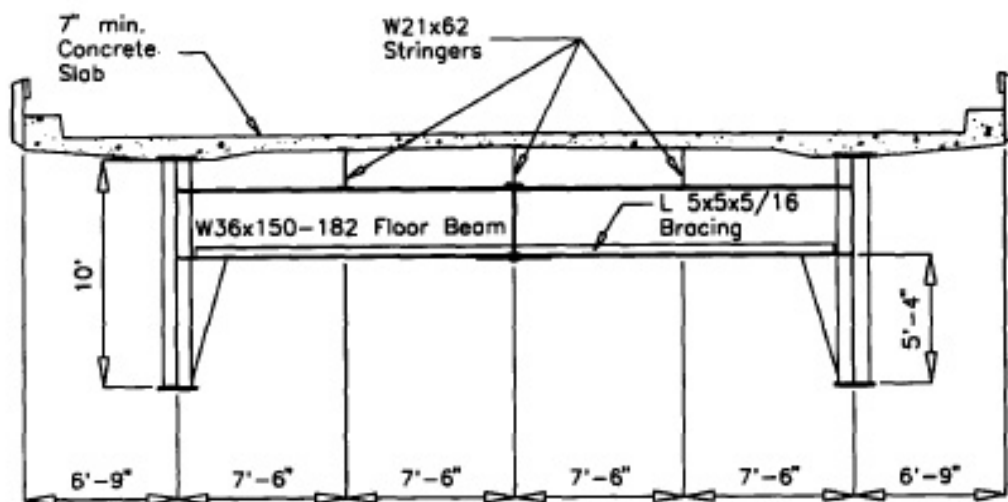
Cross-section of the I-40 bridge tested by Idriss et al. (1995)
